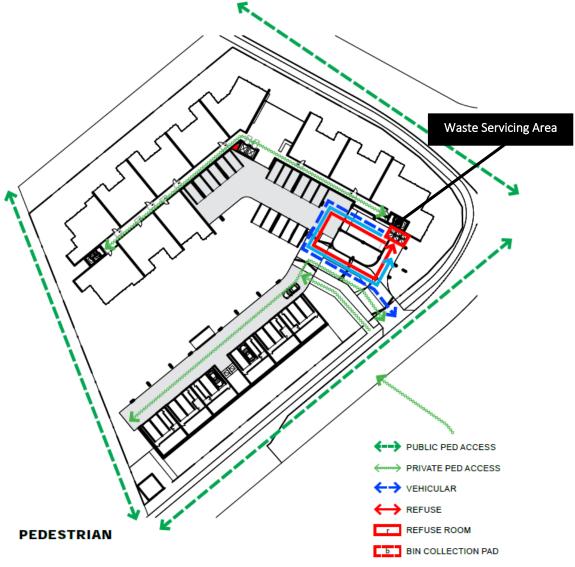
Ground floor plan (Source: Archidiom, 2022)
